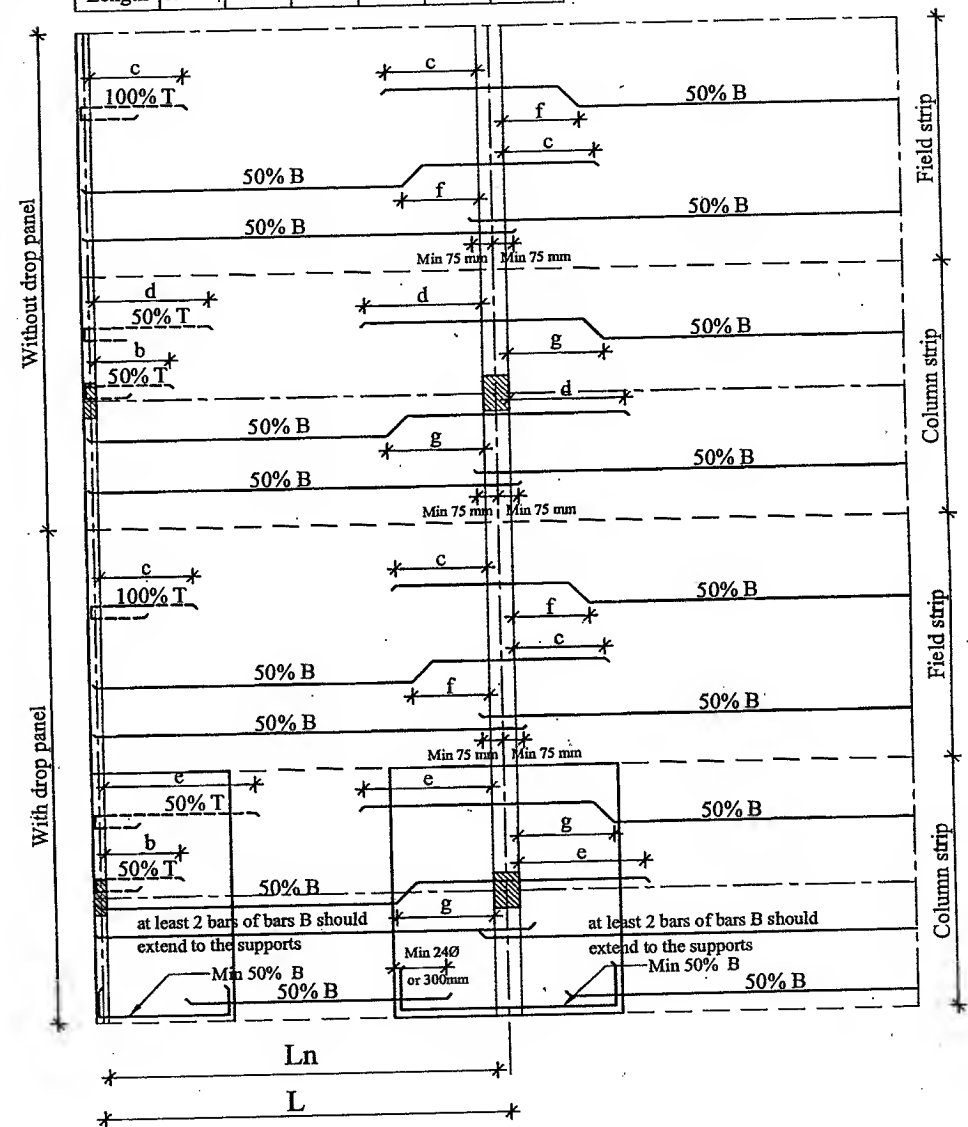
Reinforcement layout of flat slabs using bent bars
